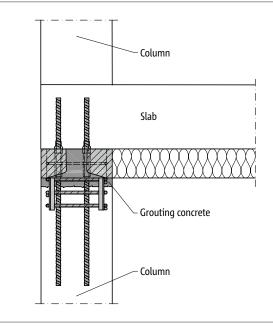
Schöck Sconnex* type P: Connection of an edge column to the above lying floor
